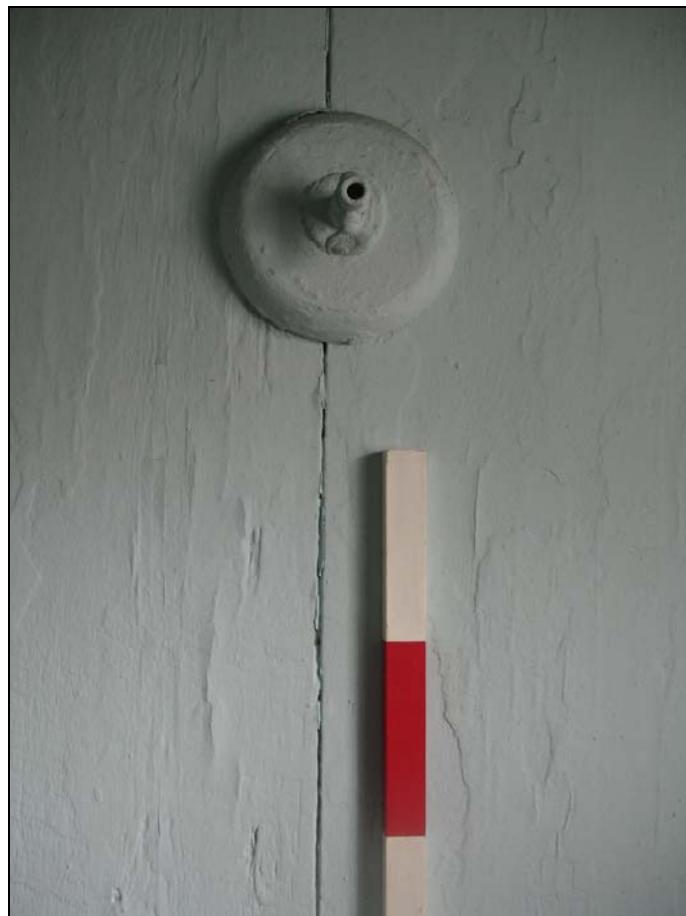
Detail of gas light fitting, located in a toilet cubical within rear E. room.
